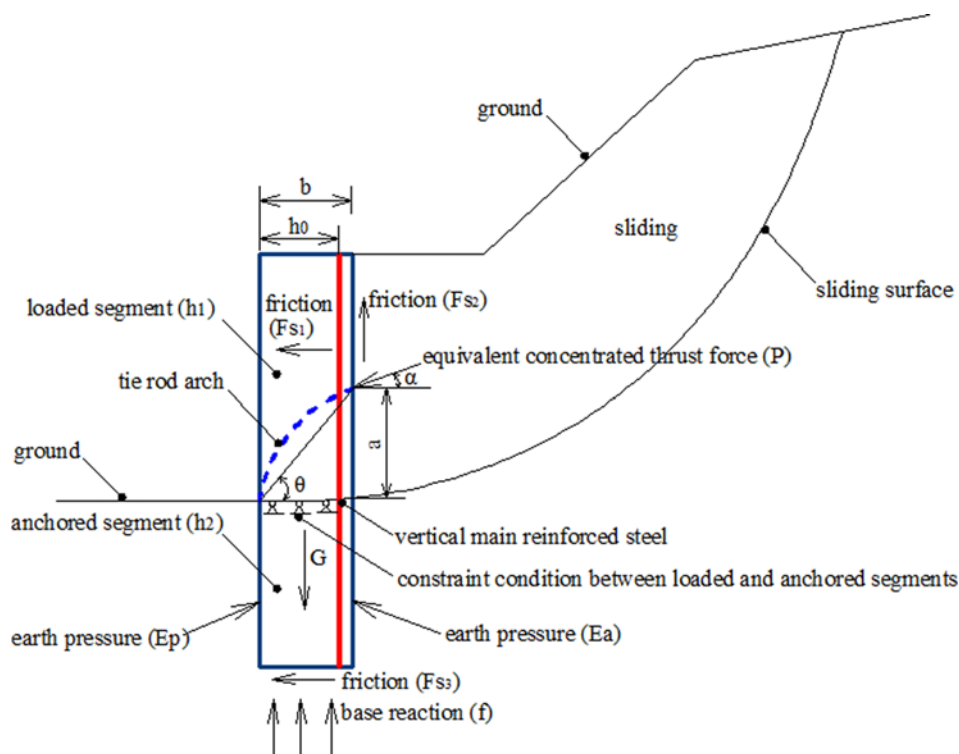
Structure and Loading Conditions of the Anti-sliding Pile
